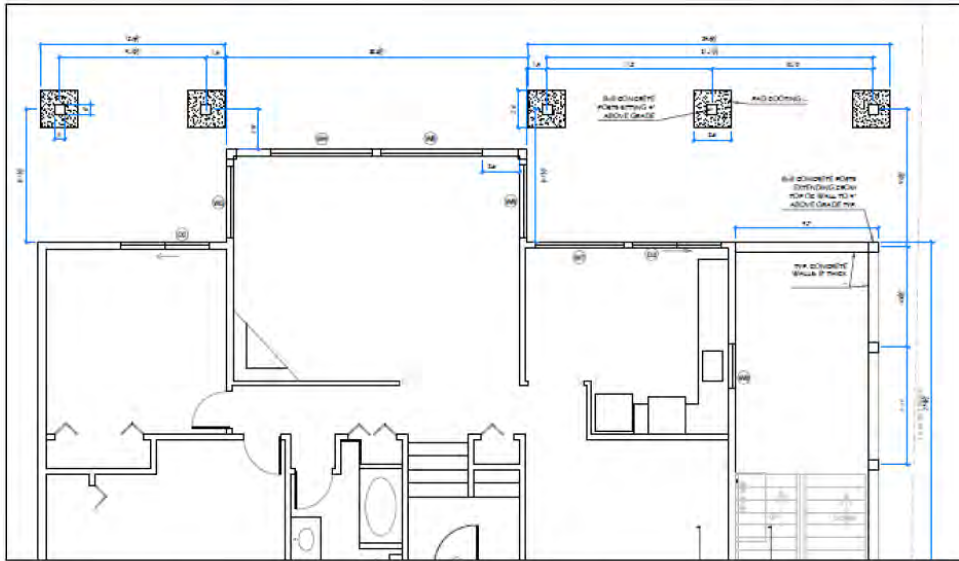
Aerial view of the proposed locations of concrete footings (north) and concrete wall (east) for the foundation. Drawings provided by Momentum Design Build.
